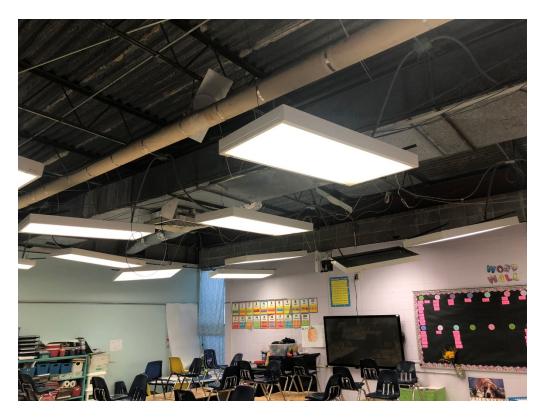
North Corner of Building 1 –  $10^{th}$  Class
